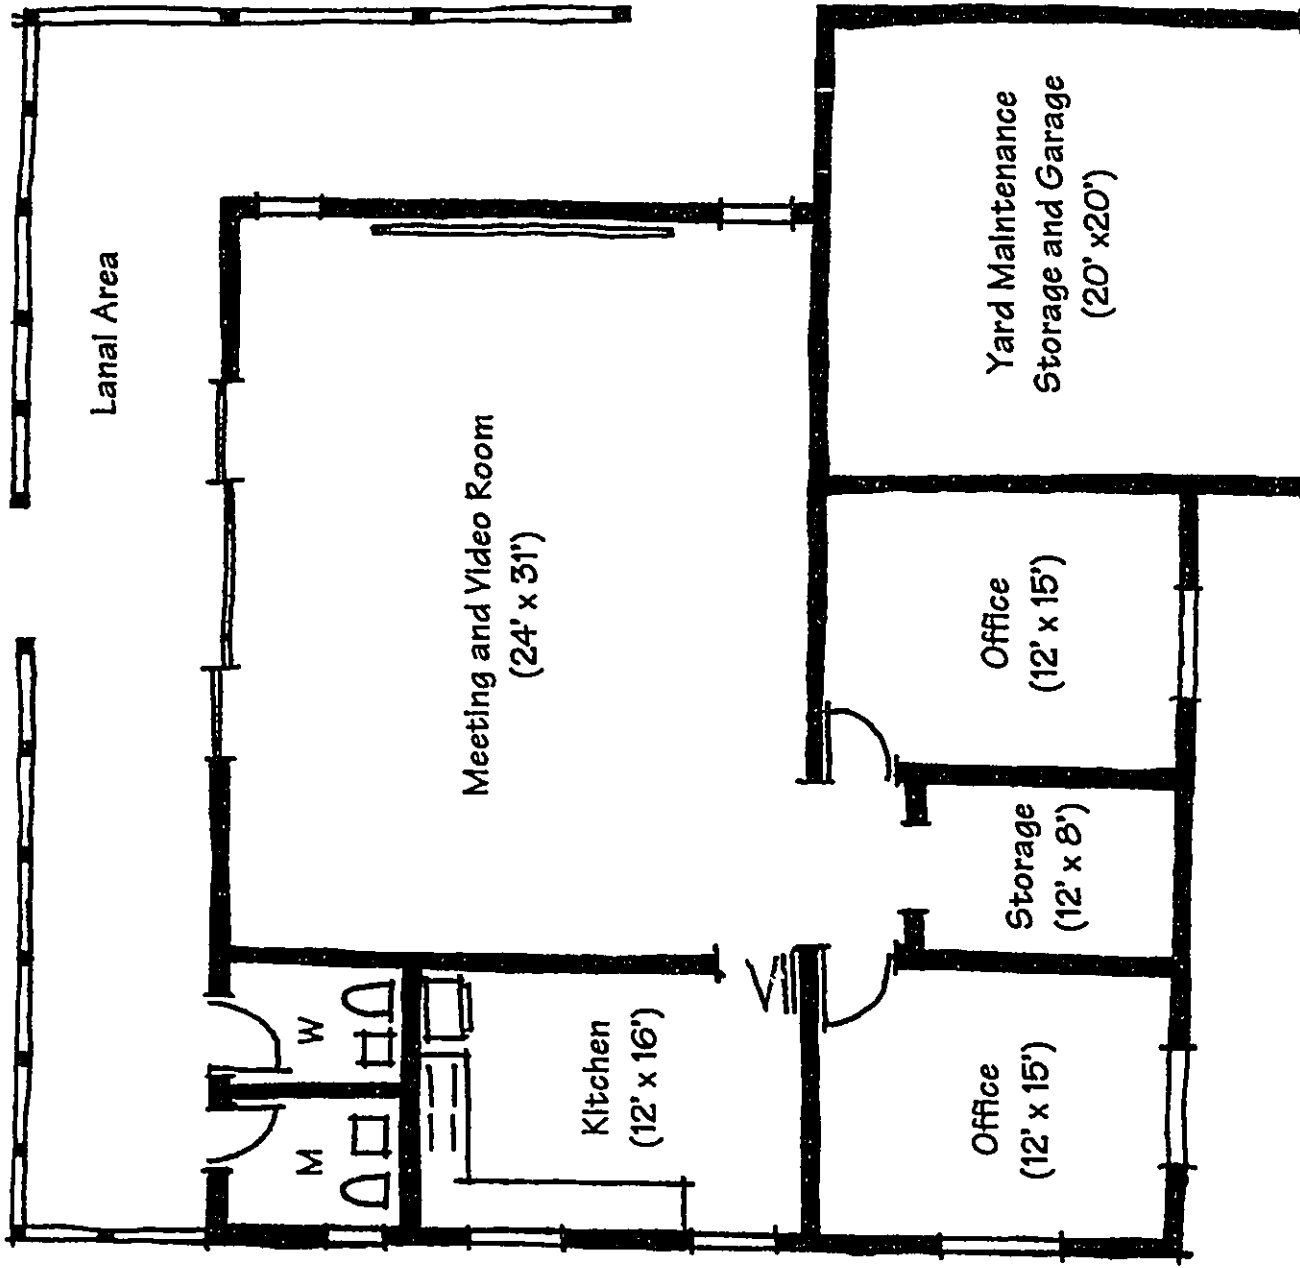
Draft Floor Plan of the Proposed Hale (approx scale: 1/8"=1')
